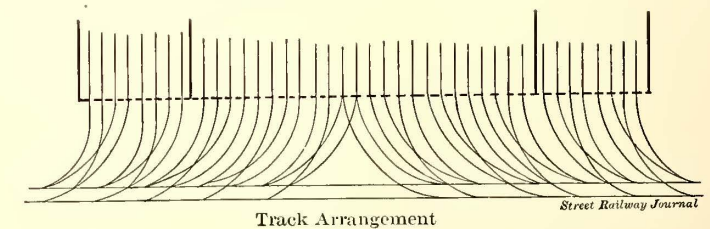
PLAN OF TRACK ARRANGEMENT
